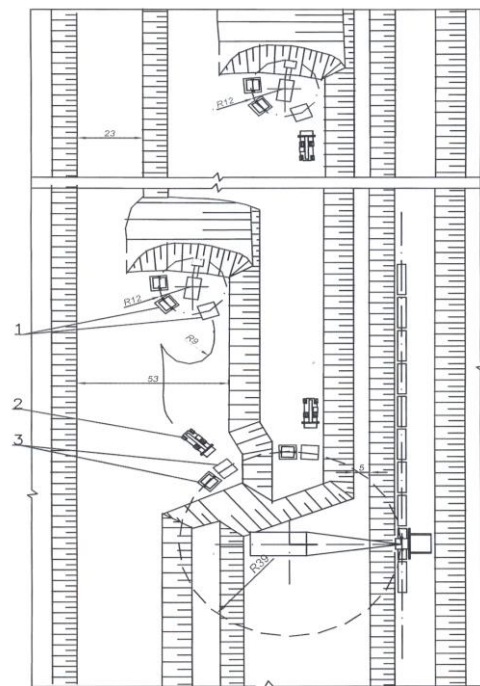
Plan of energy-saving container technology in opencast mining. 1 – containers under loading, 2 – container carriers; 3 – containers on the platform at the hoist
